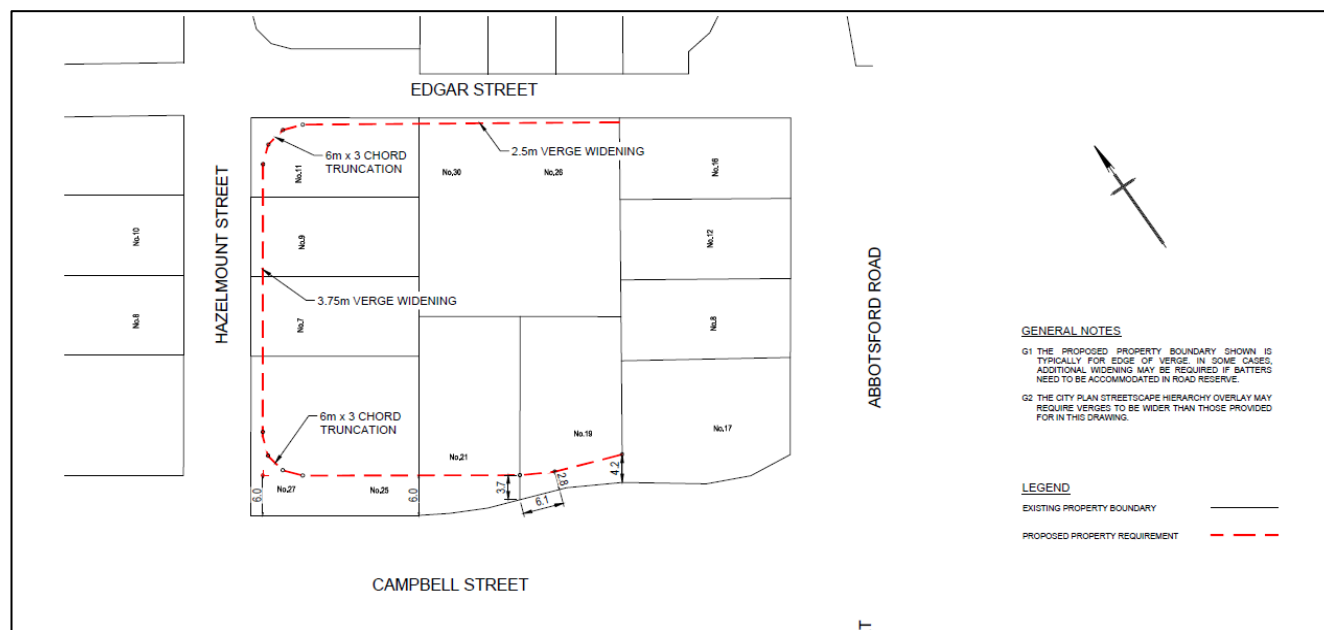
Road Widening Plans (Source: Brisbane City Council)
